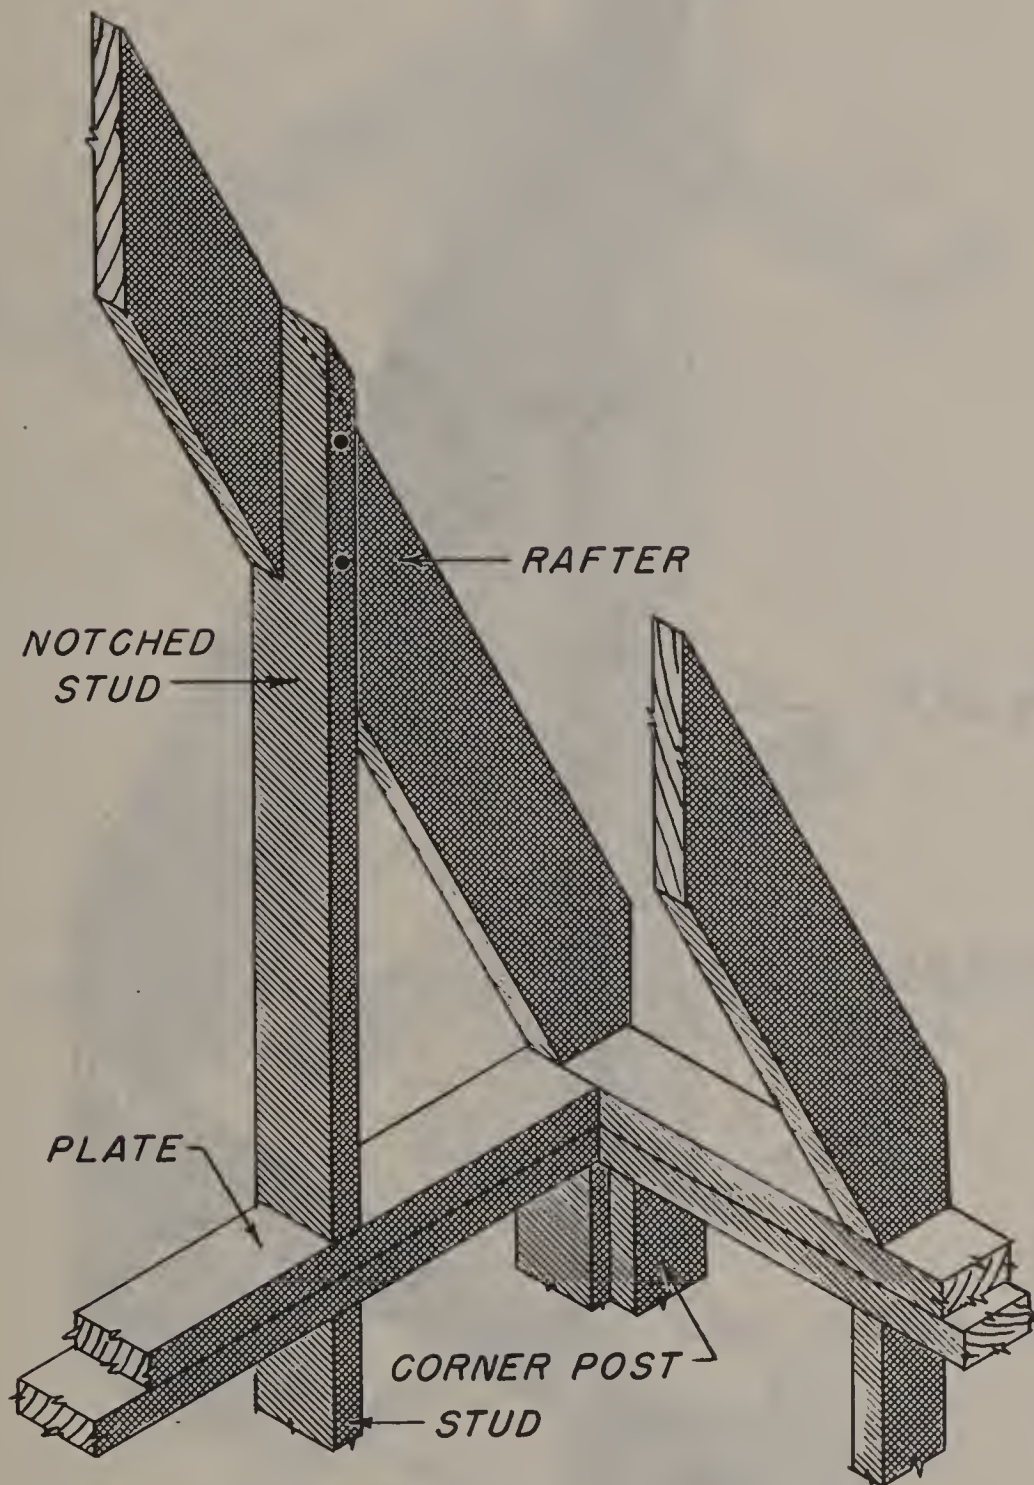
Notched gable stud. Stud nailed to rafter with two tenpenny nails.
